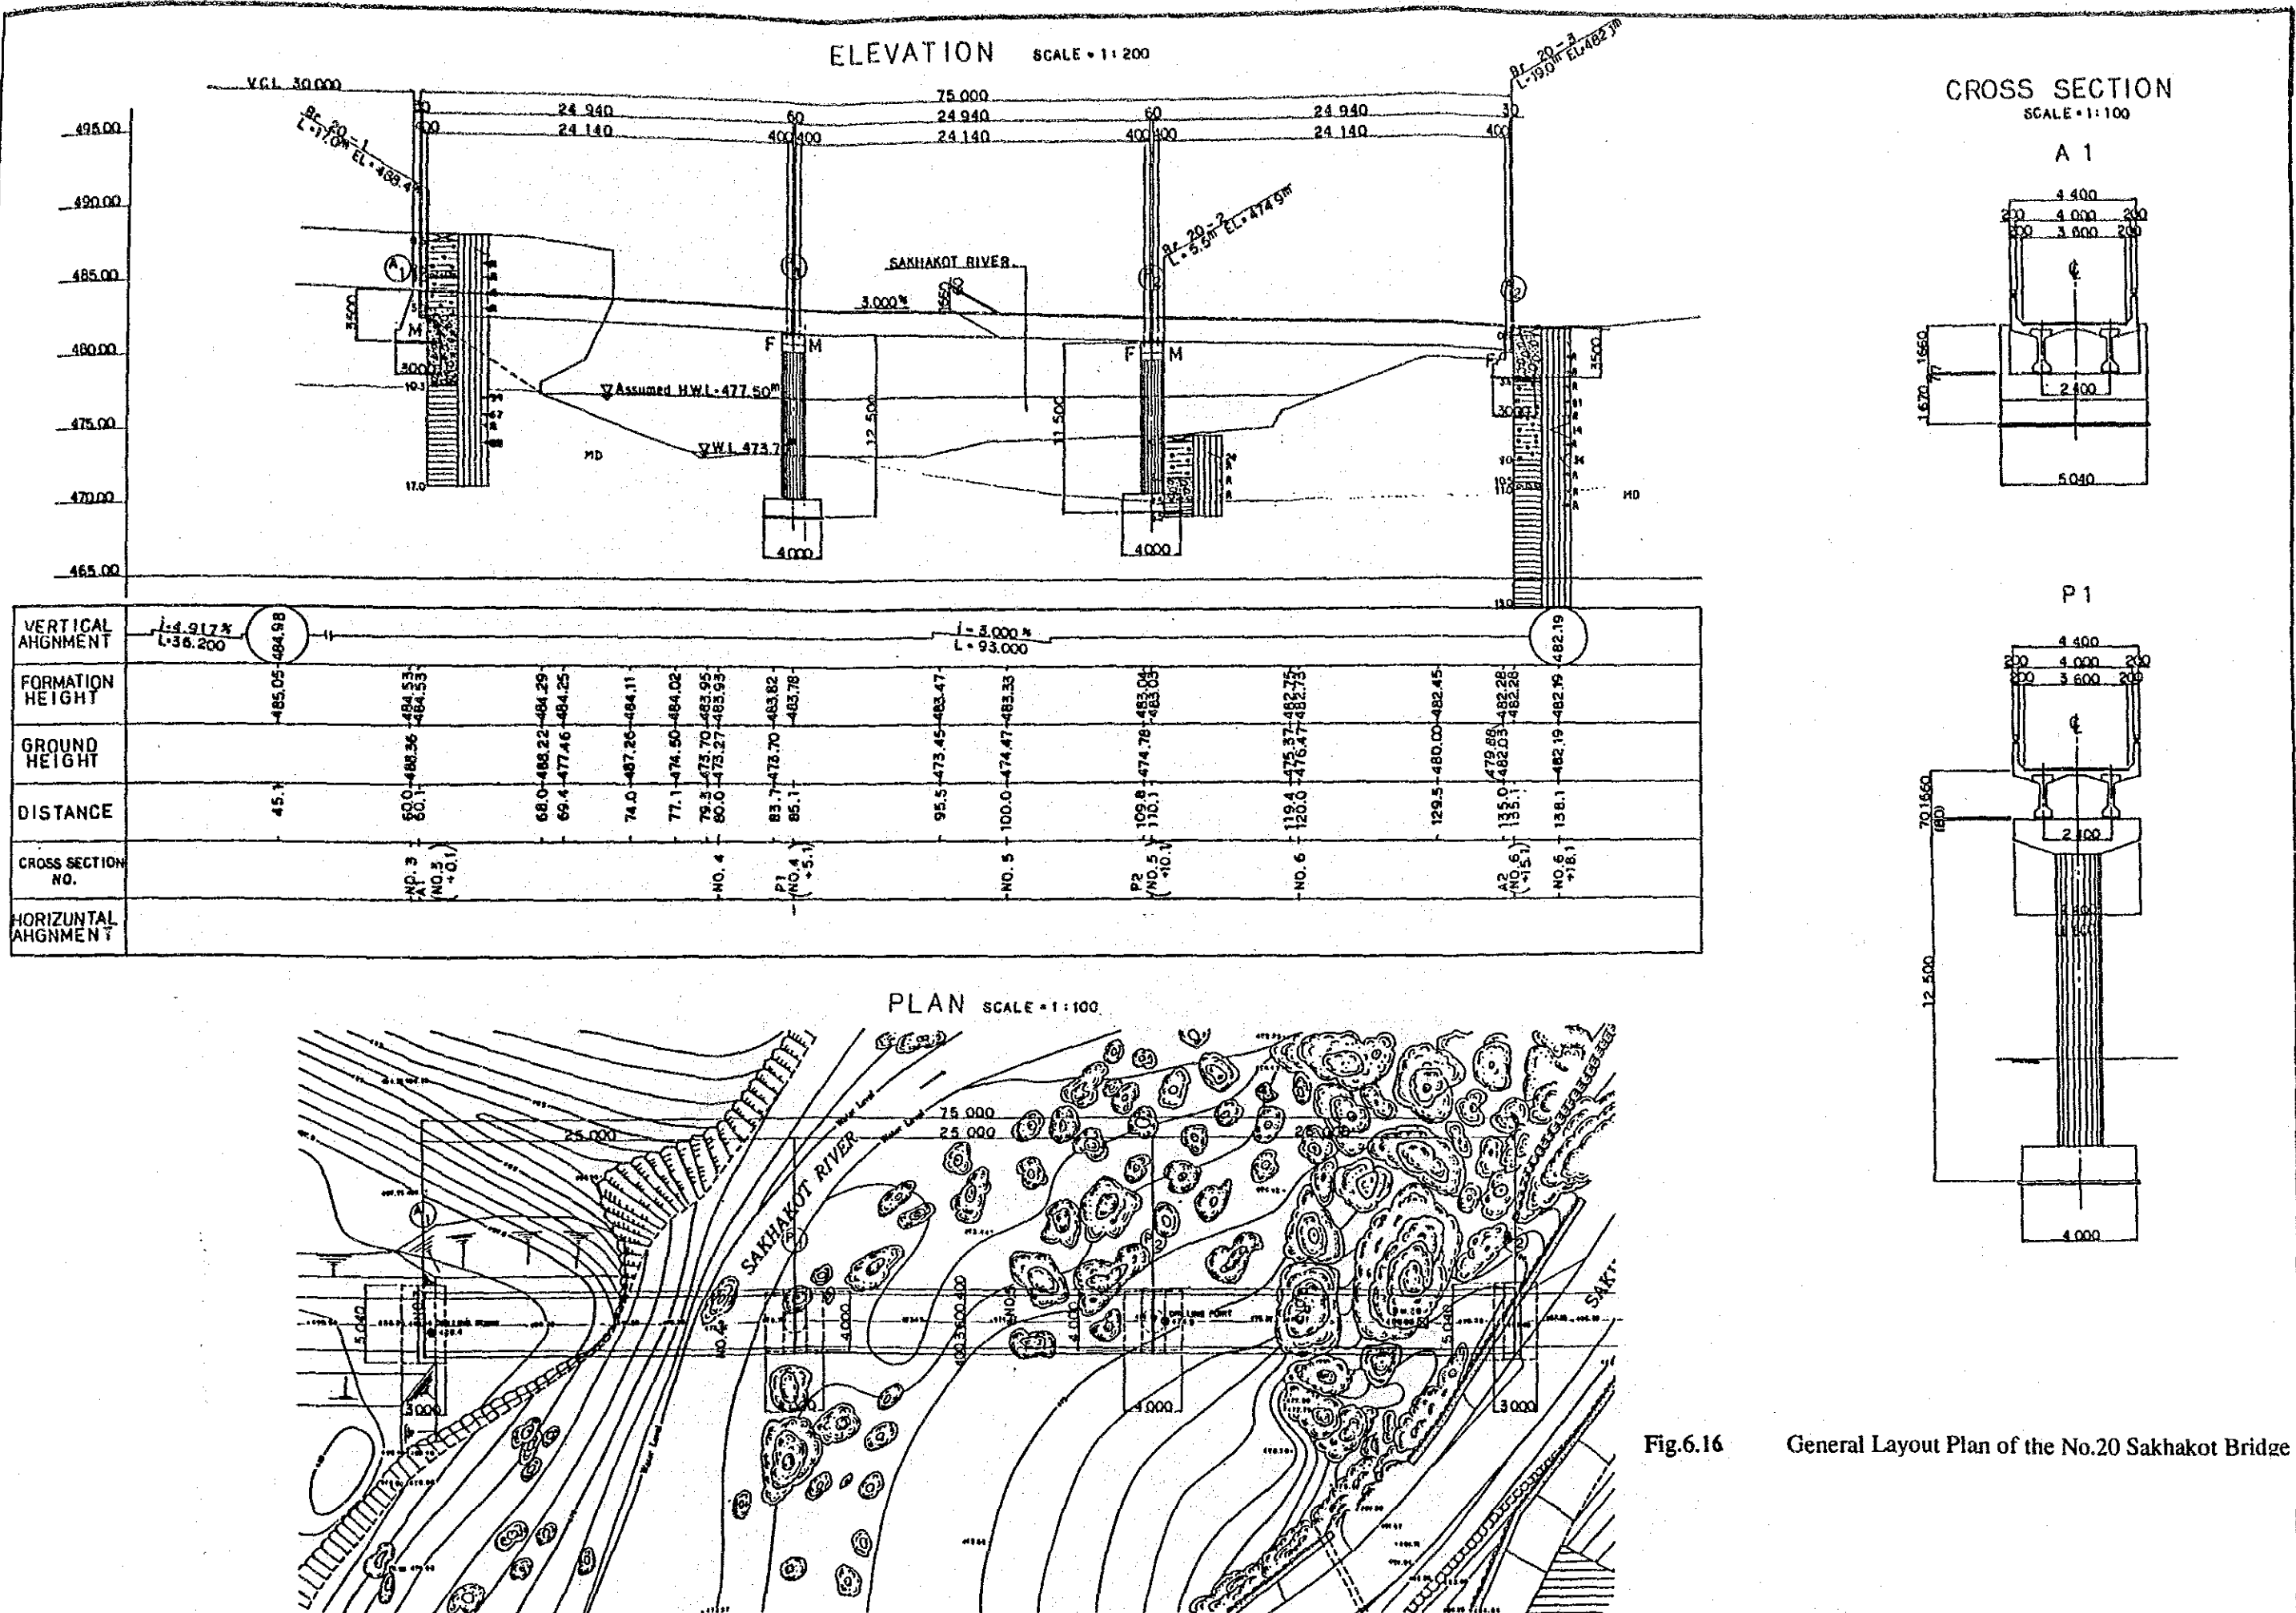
General Layout Plan of the No.20 Sakhakot Bridge
